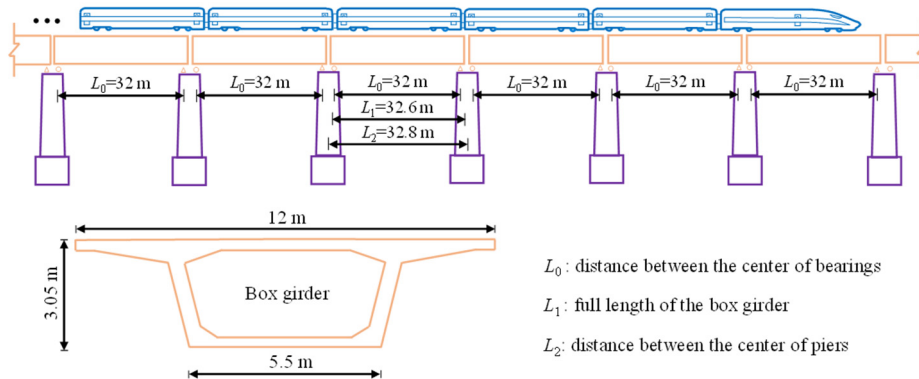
The 32 m box girder bridge traversed by high-speed train
